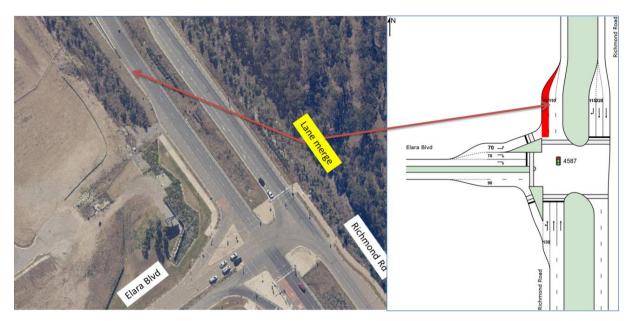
Lane merge on Richmond Road northbound, north of Elara Boulevard
